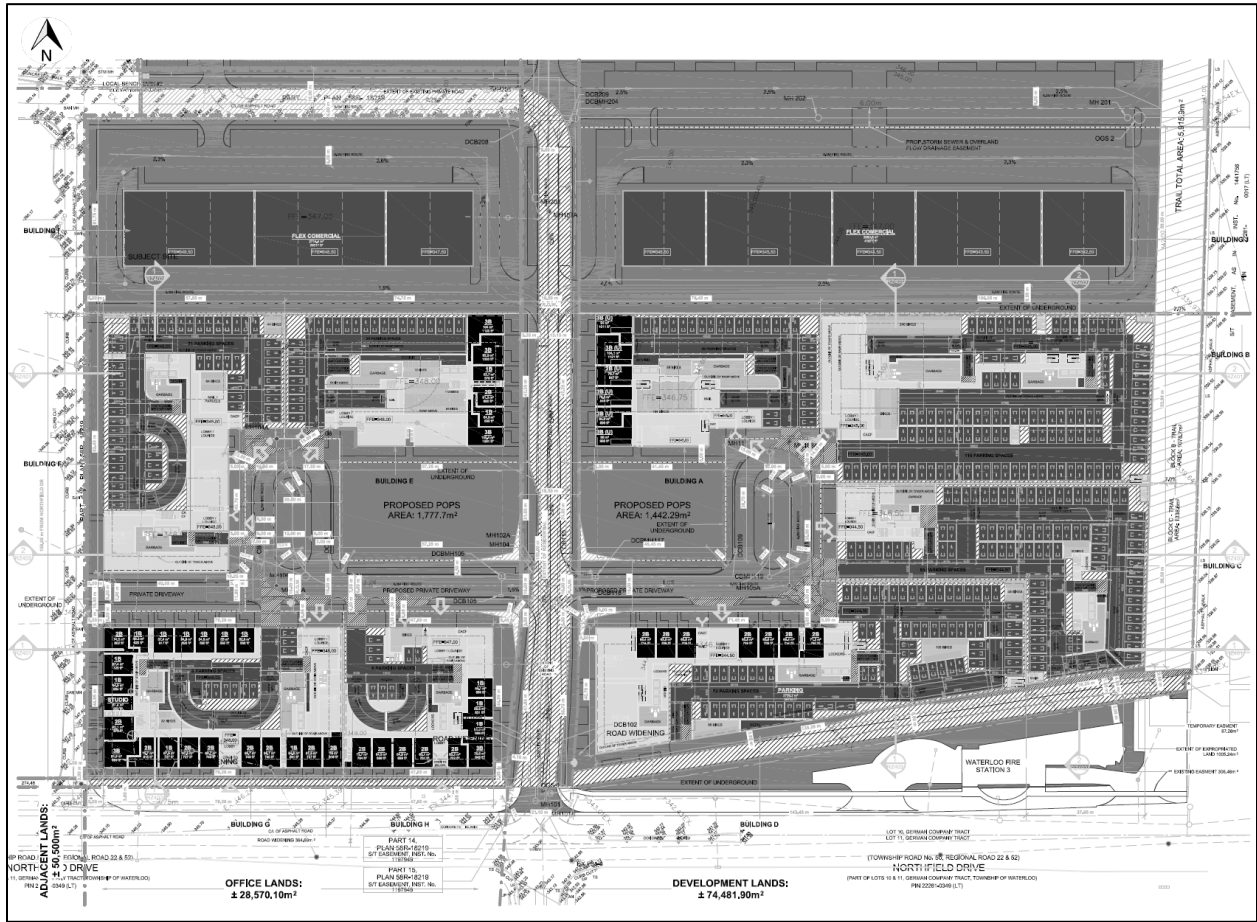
Plan view showing the Ground Floor of the Site. Source: Turner Fleischer Architects Inc. Floor 01 DWG No. RZ151 provided 11-Mar-2024.
